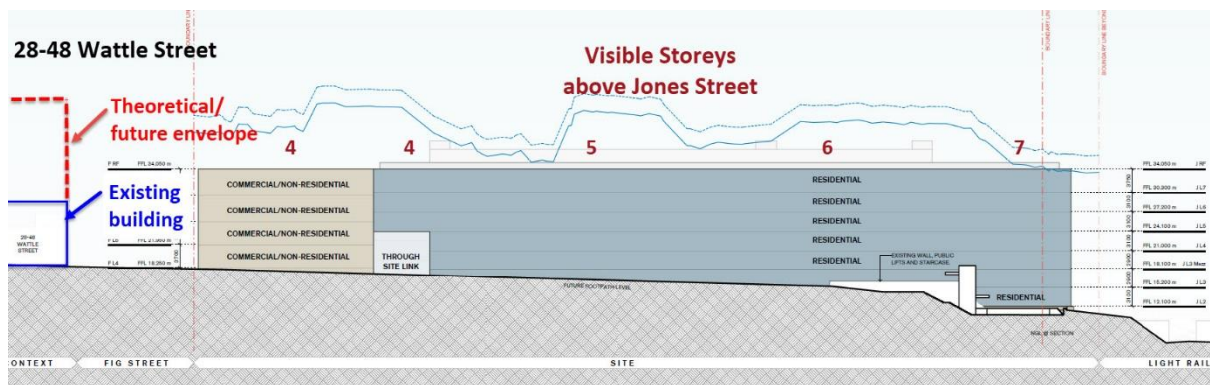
Proposed Storeys: Indicative Reference Scheme - Jones Street Elevation
